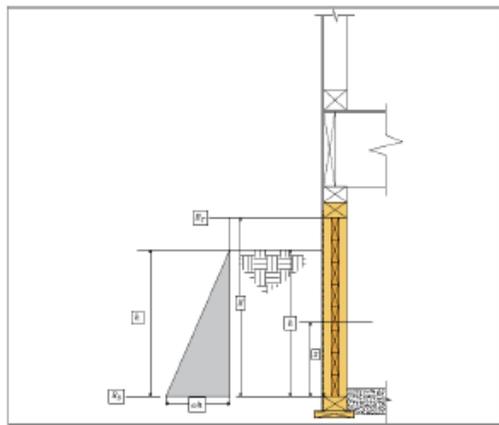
Foundation Walls with Basement Resisting Lateral Soil Load
